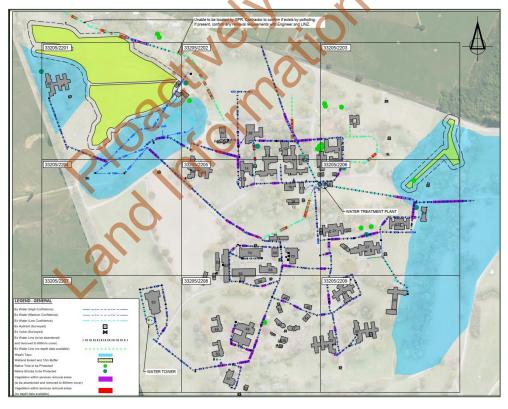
Overview plan of water line layout (marked in dark and light blue)
